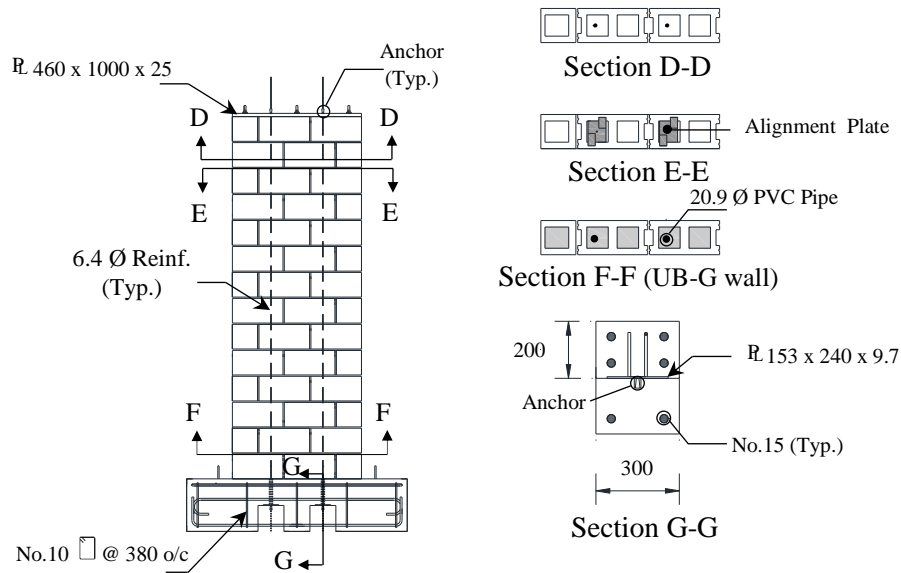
Geometry of ungrouted walls with unbonded reinforcement (dimensions in mm).
